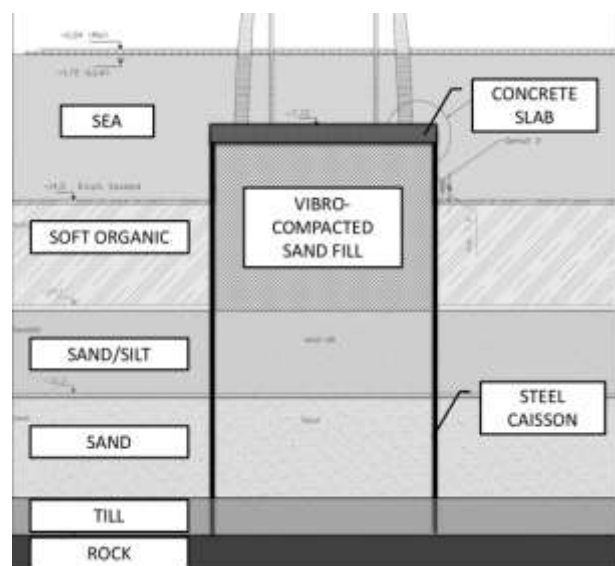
Foundation conditions of bridge pier with vibratory-compacted sand inside steel caisson.
